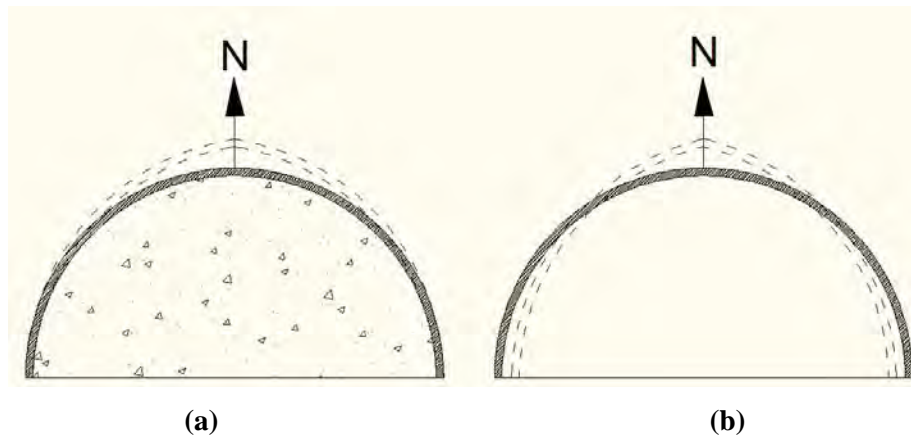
(a) Concrete column wrapped with steel jacketing under perpendicular tension loading; (b) CHS section under perpendicular tension loading
